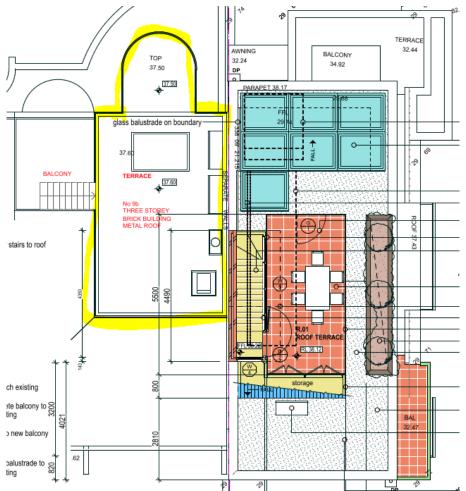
Roof terrace of 9B shown hi-lighted in yellow set further forward than proposed terrace of 9A.
